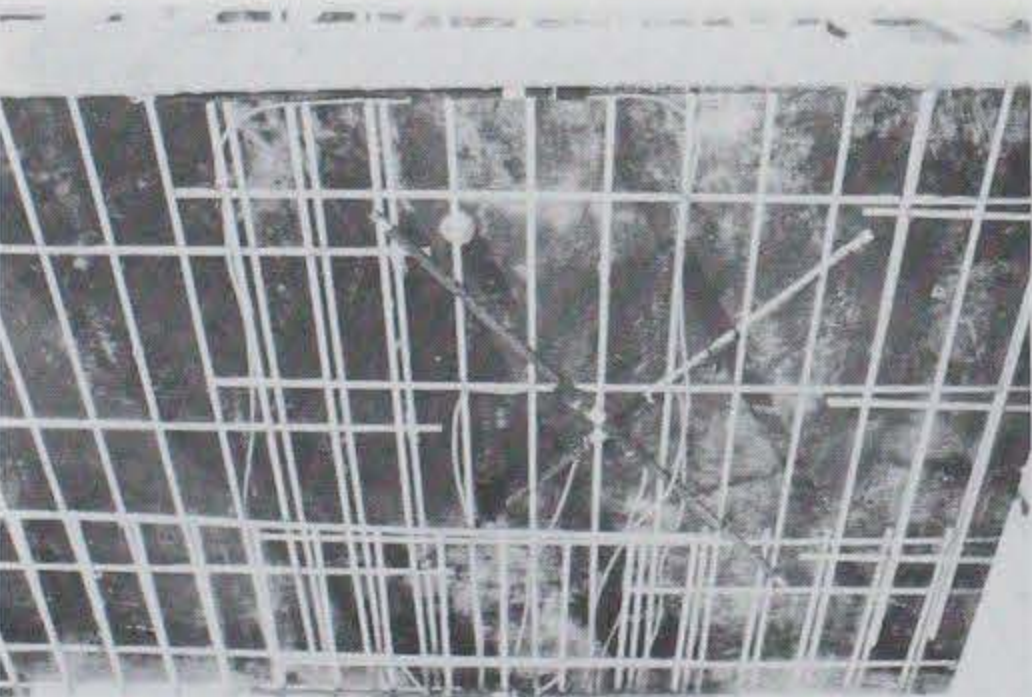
Photo depicting embedded strain gages in sidewall and upper and lower edges.
